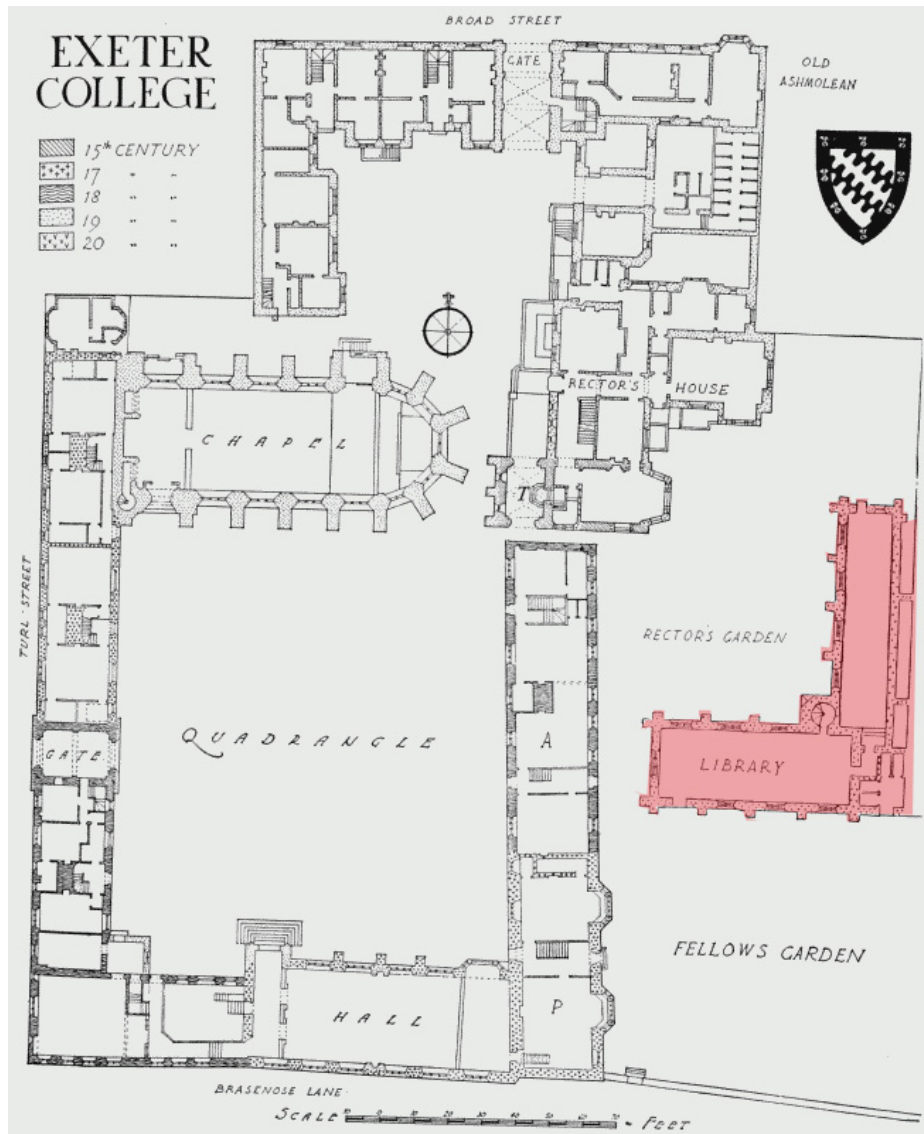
c.1954 site plan showing the layout of the Library, which had not changed since c.1876-8 (Exeter College Archive)
